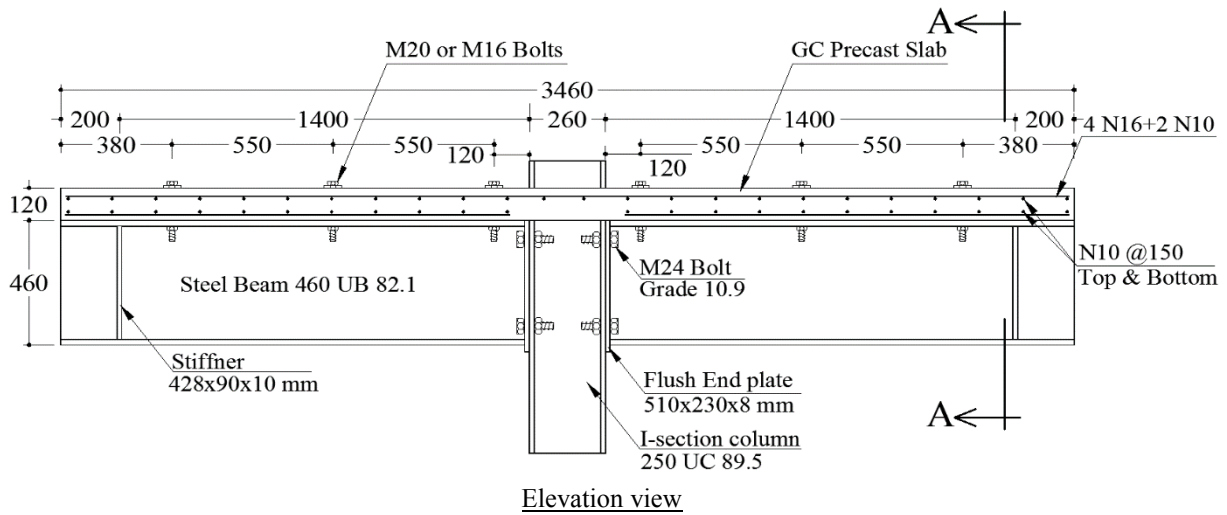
Geometry and details of joints CJ3 and CJ4 (unit: mm).
